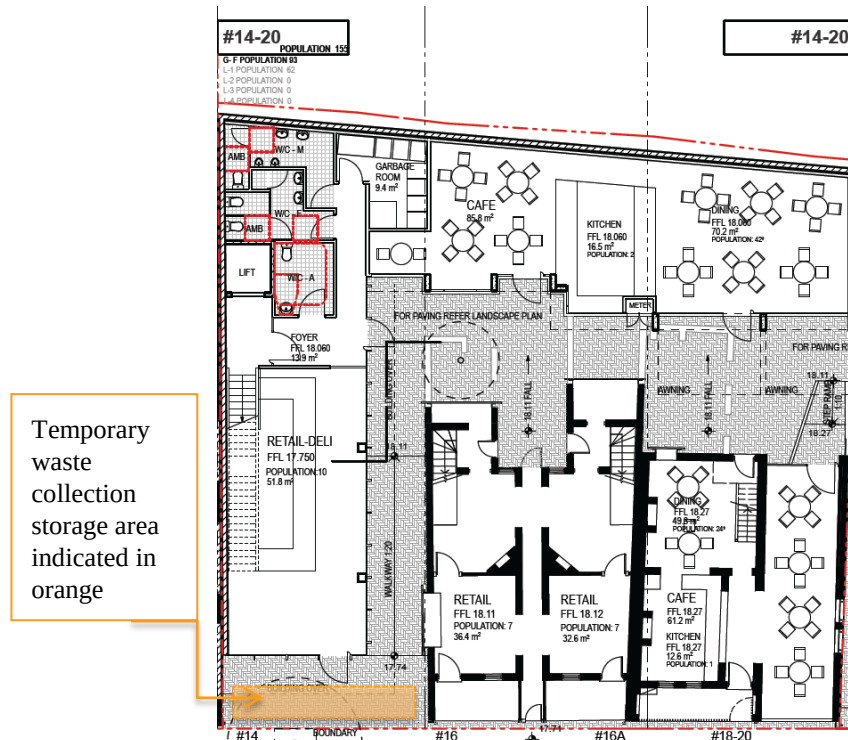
Temporary waste bin storage area for collection, building section #14-20
